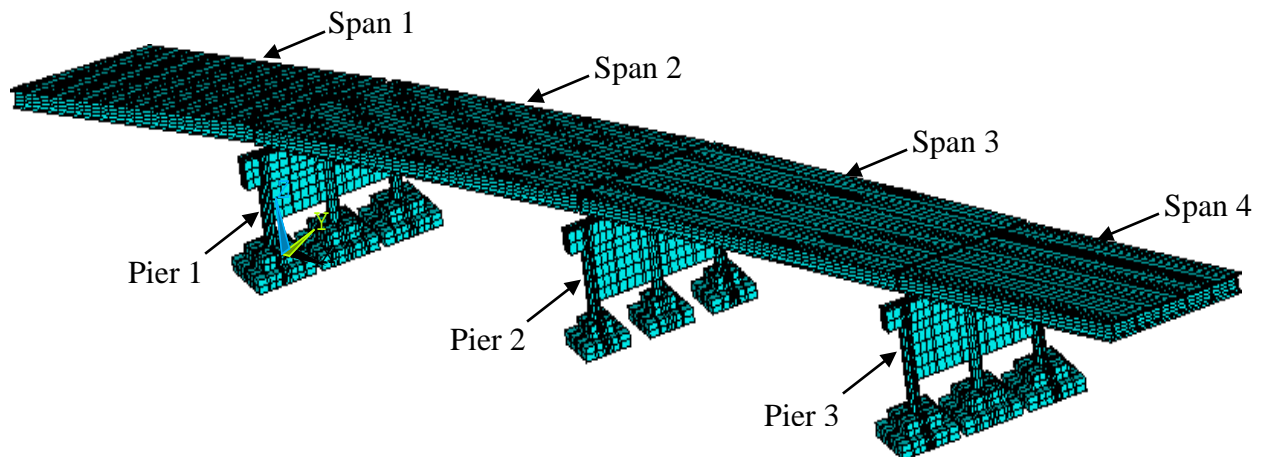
Span and pier labels for the New Trammel Creek Bridge FE model.
